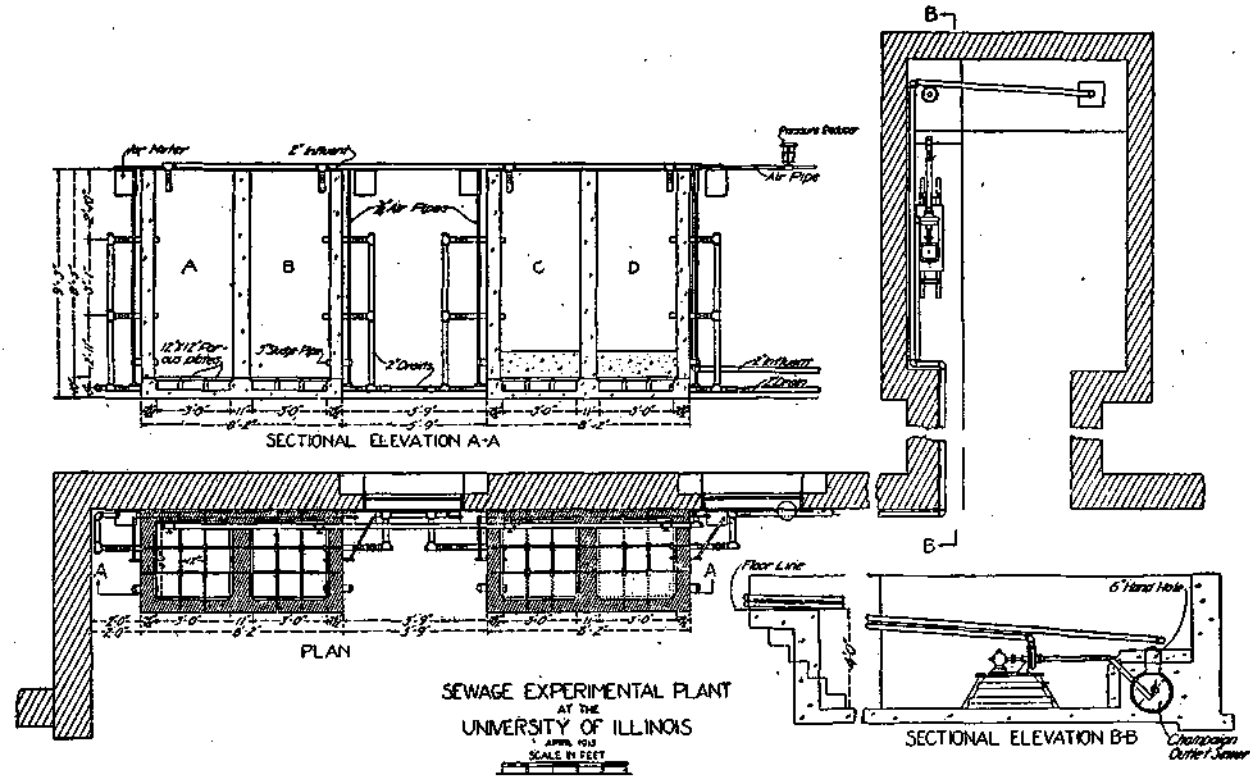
Plan of concrete tanks for treatment of sewage by activated-sludge process.
